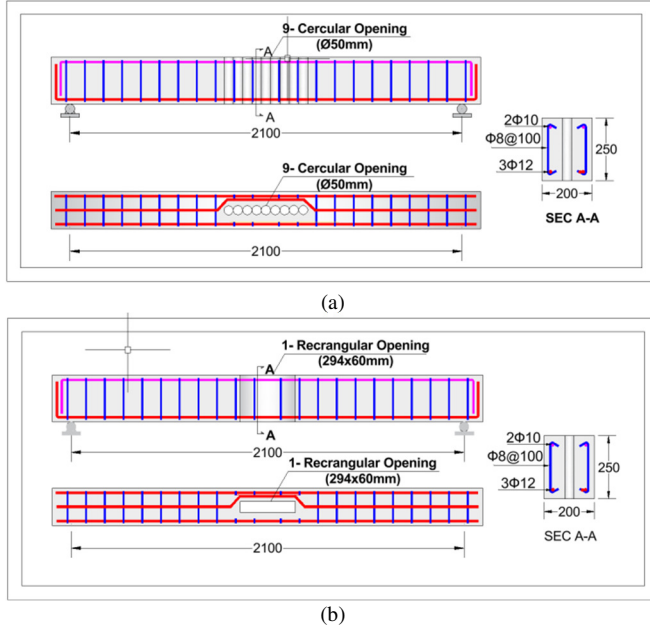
Details of beams with openings: (a) B1-C-C9-WS, a beam with an unreinforced 50 mm circular opening; (b) B2-C-S1-WS, a beam with an unreinforced rectangular opening.
